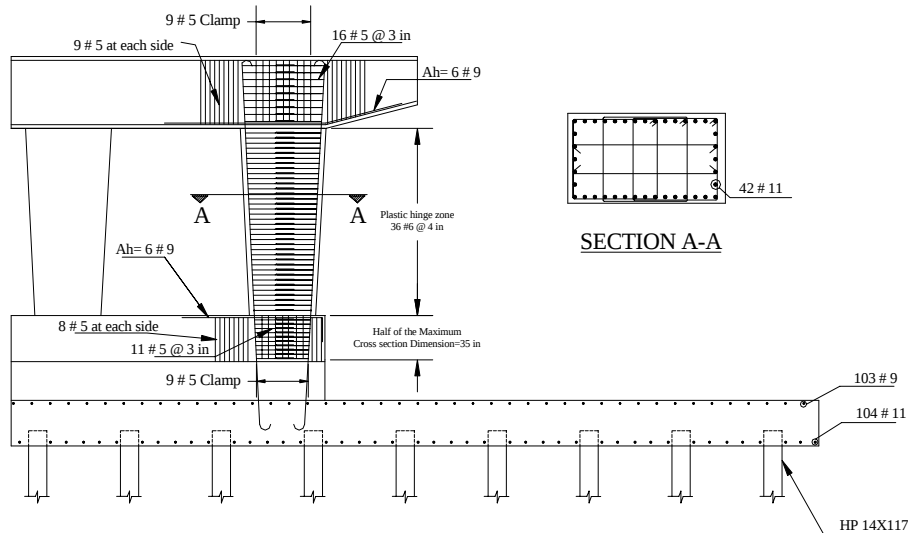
Reinforcement details for Columns, Footing and Cap beam (front view)
